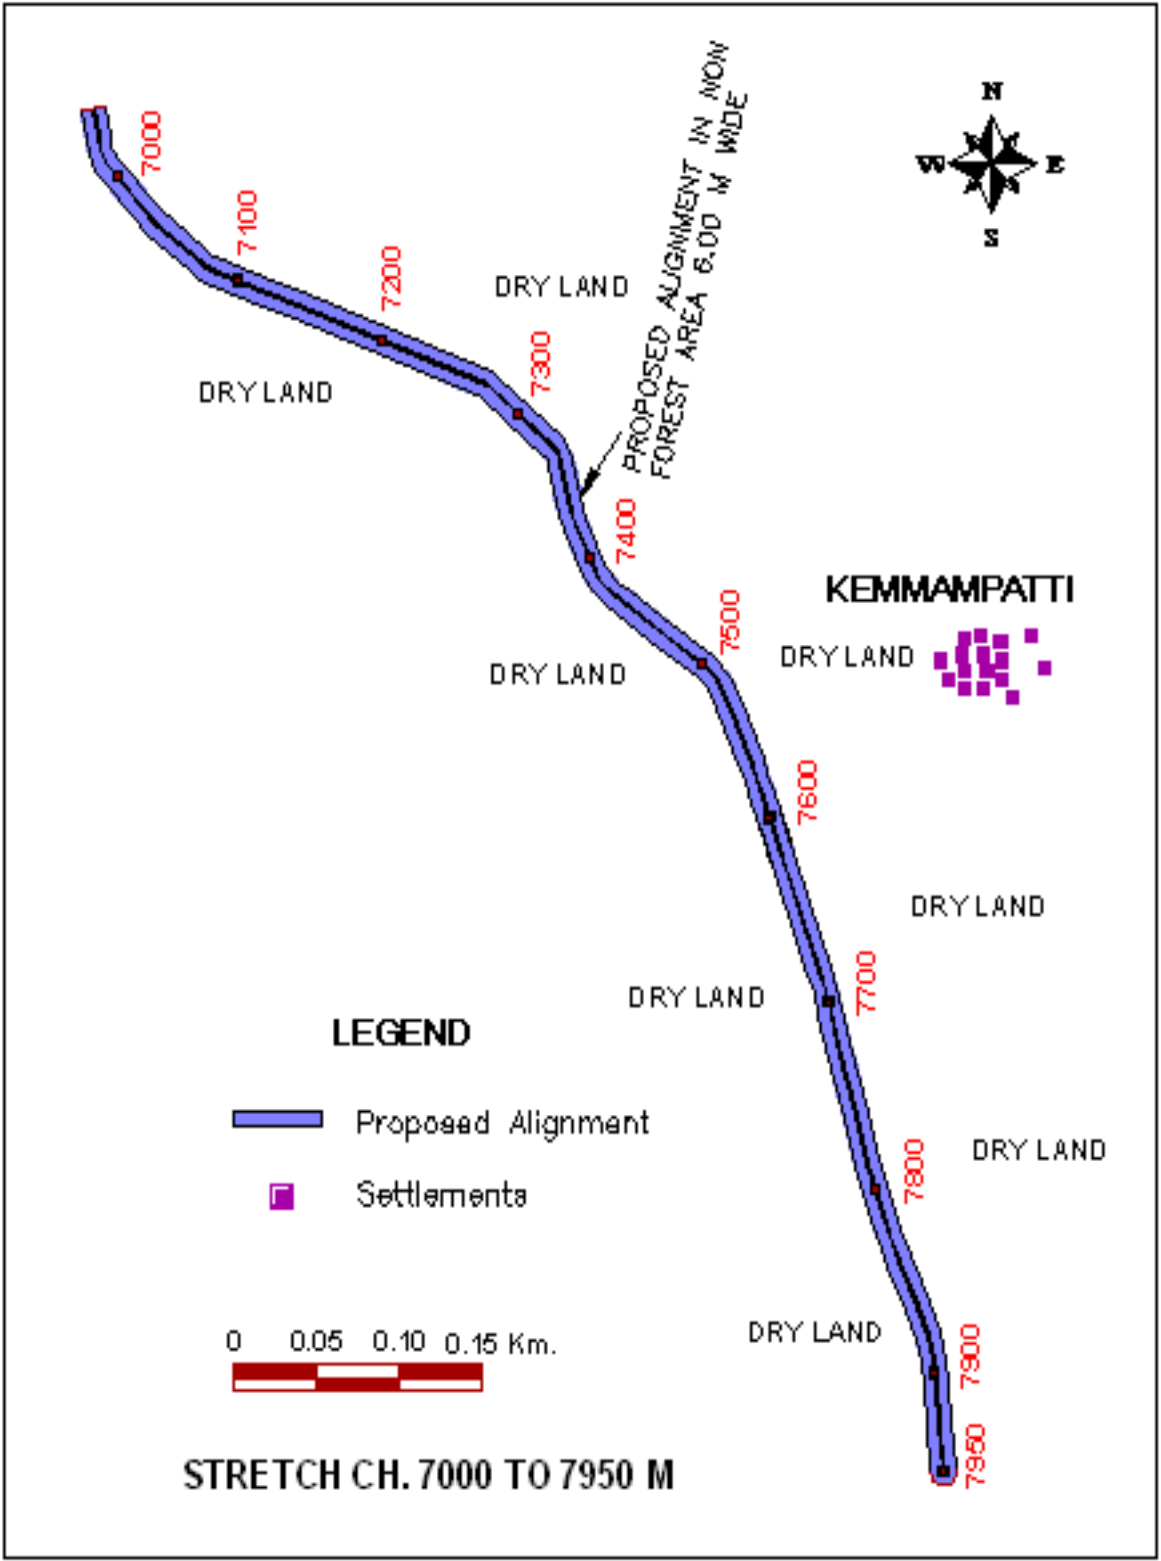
(e) - Alignment plan from 7000 m to 7950 m
